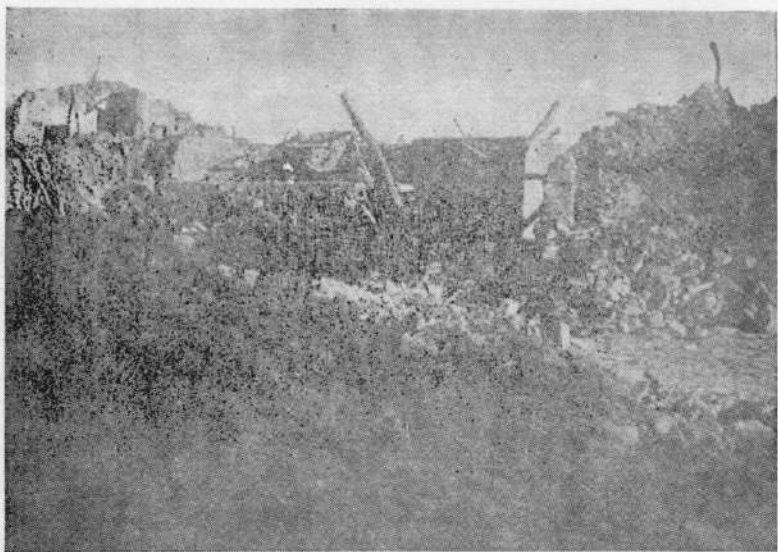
Destruction of adobe Houses in village Al-Olayb. See choking of streets.
